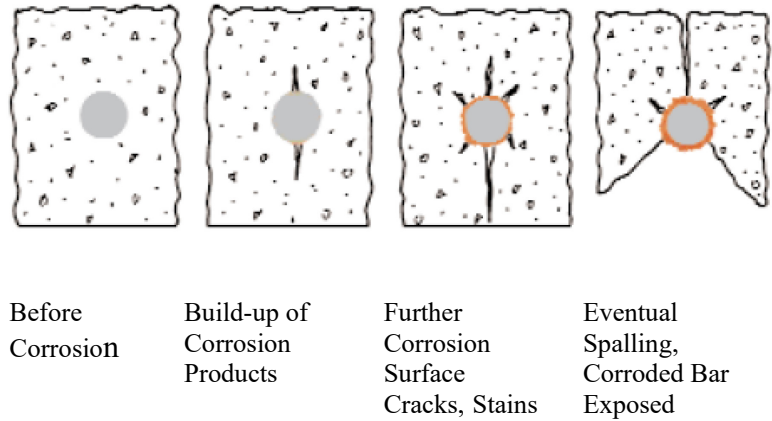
Influence of reinforcing steel on surrounding concrete
